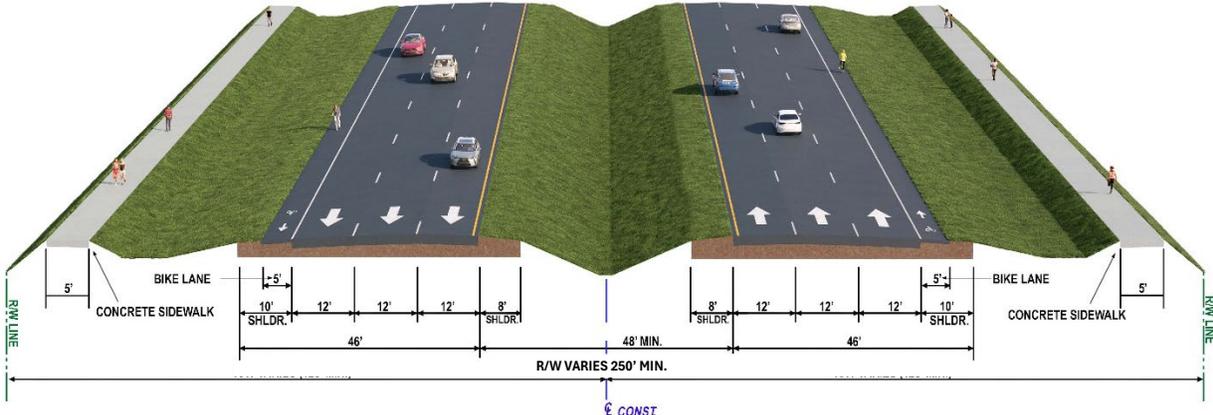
Existing Typical Section – SR 54 One-Half Mile West of US 41
